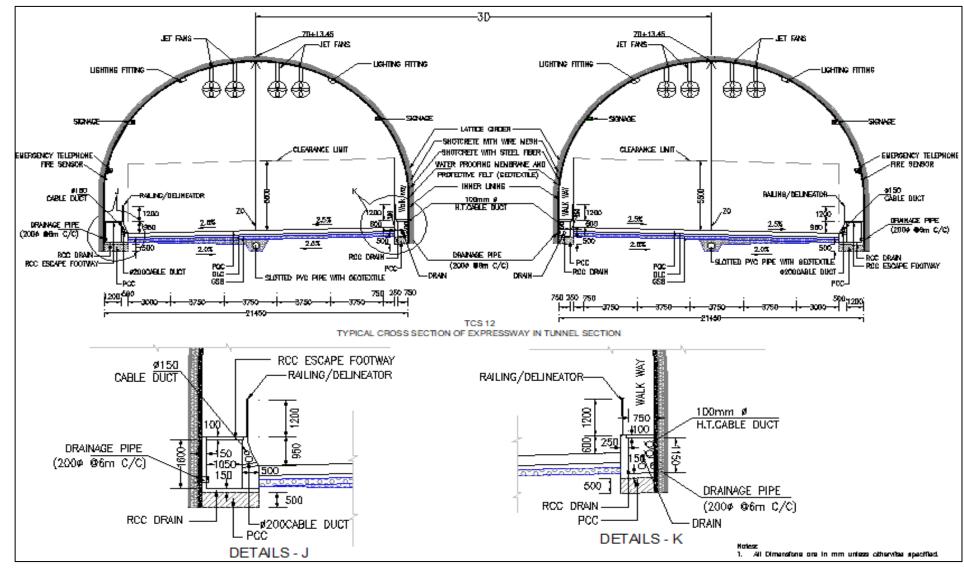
Typical Cross Section of Expressway in Tunnel Section
